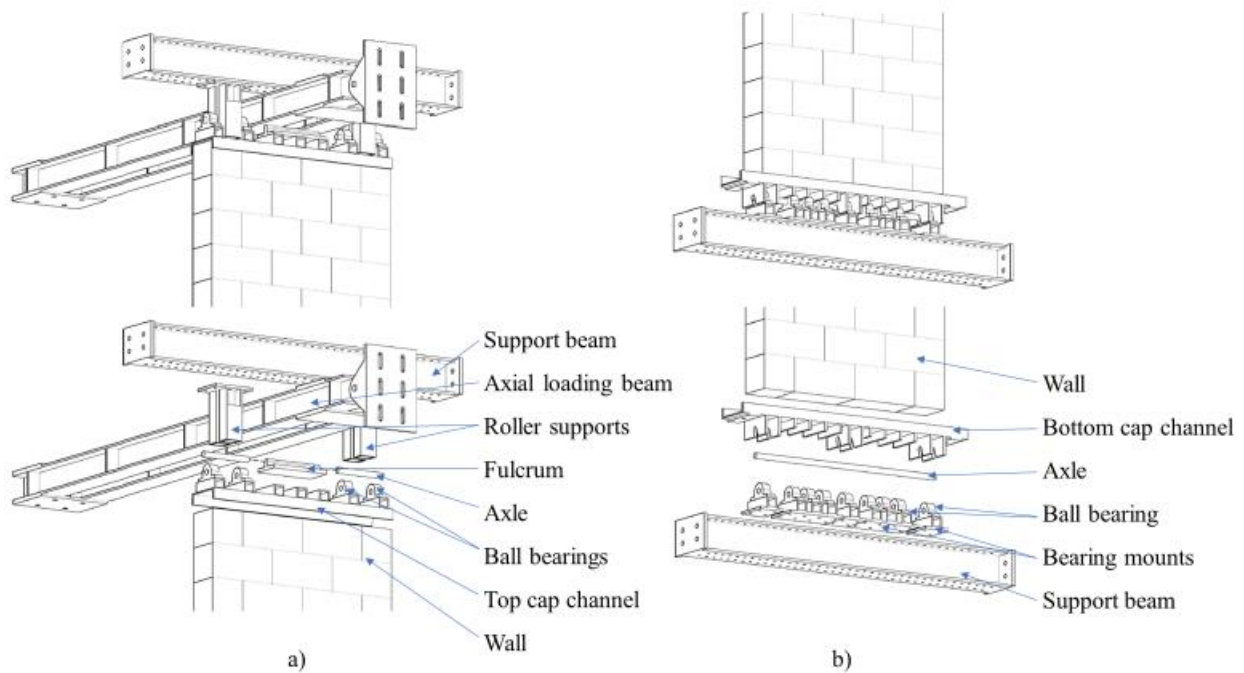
Detail of support connections using pillow block bearings: a) top roller connection and b) bottom pin connection
